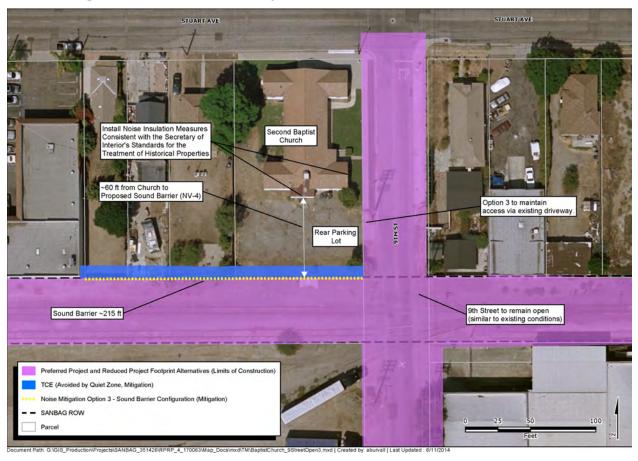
Location and Length of Sound Barrier That Would Be Developed under Noise Mitigation Option 3, with Distance between Barrier and Second Baptist Church Building.
